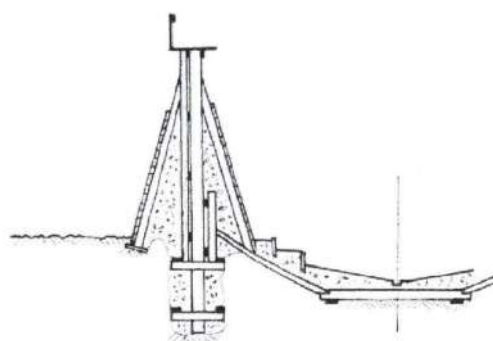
Minihic-sur-Rance, 1908. Detail of section of dock wall (Le Rot 1976).
